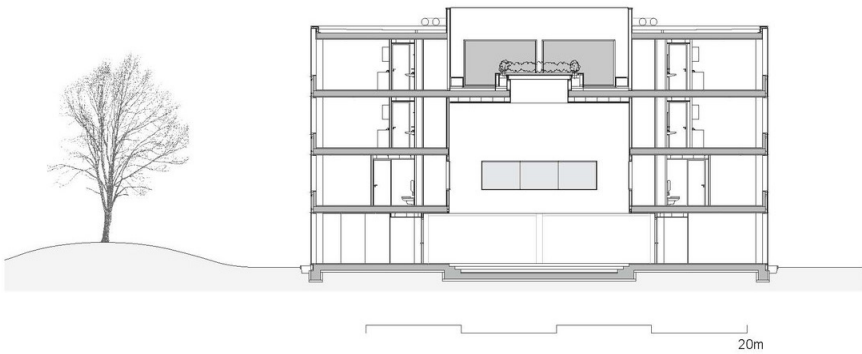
Section [Archdaily, n.d.]
